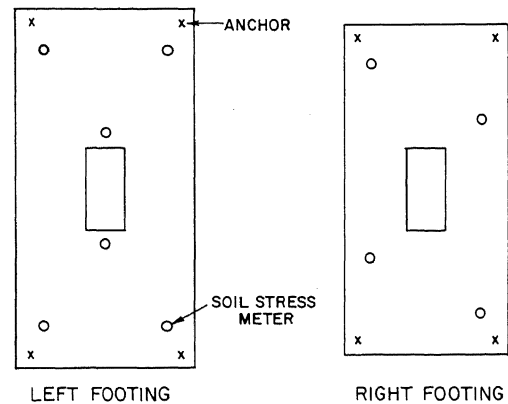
Locations of Soil Stress Meters Installed at Base of Footings
